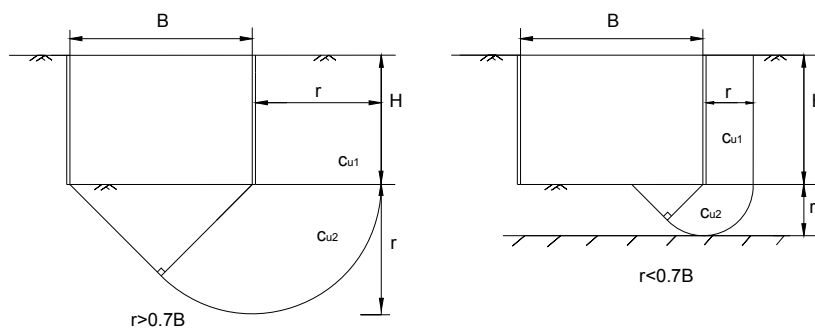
Bottom Heave Analysis for Wide Excavation ($B/H > 1$) (Terzaghi, 1943)
